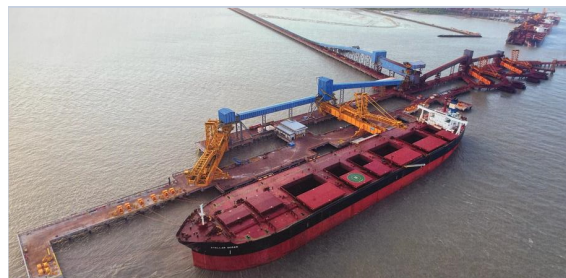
Offshore Project - First test with Pier IV North Load. Source: VALE (2018).
